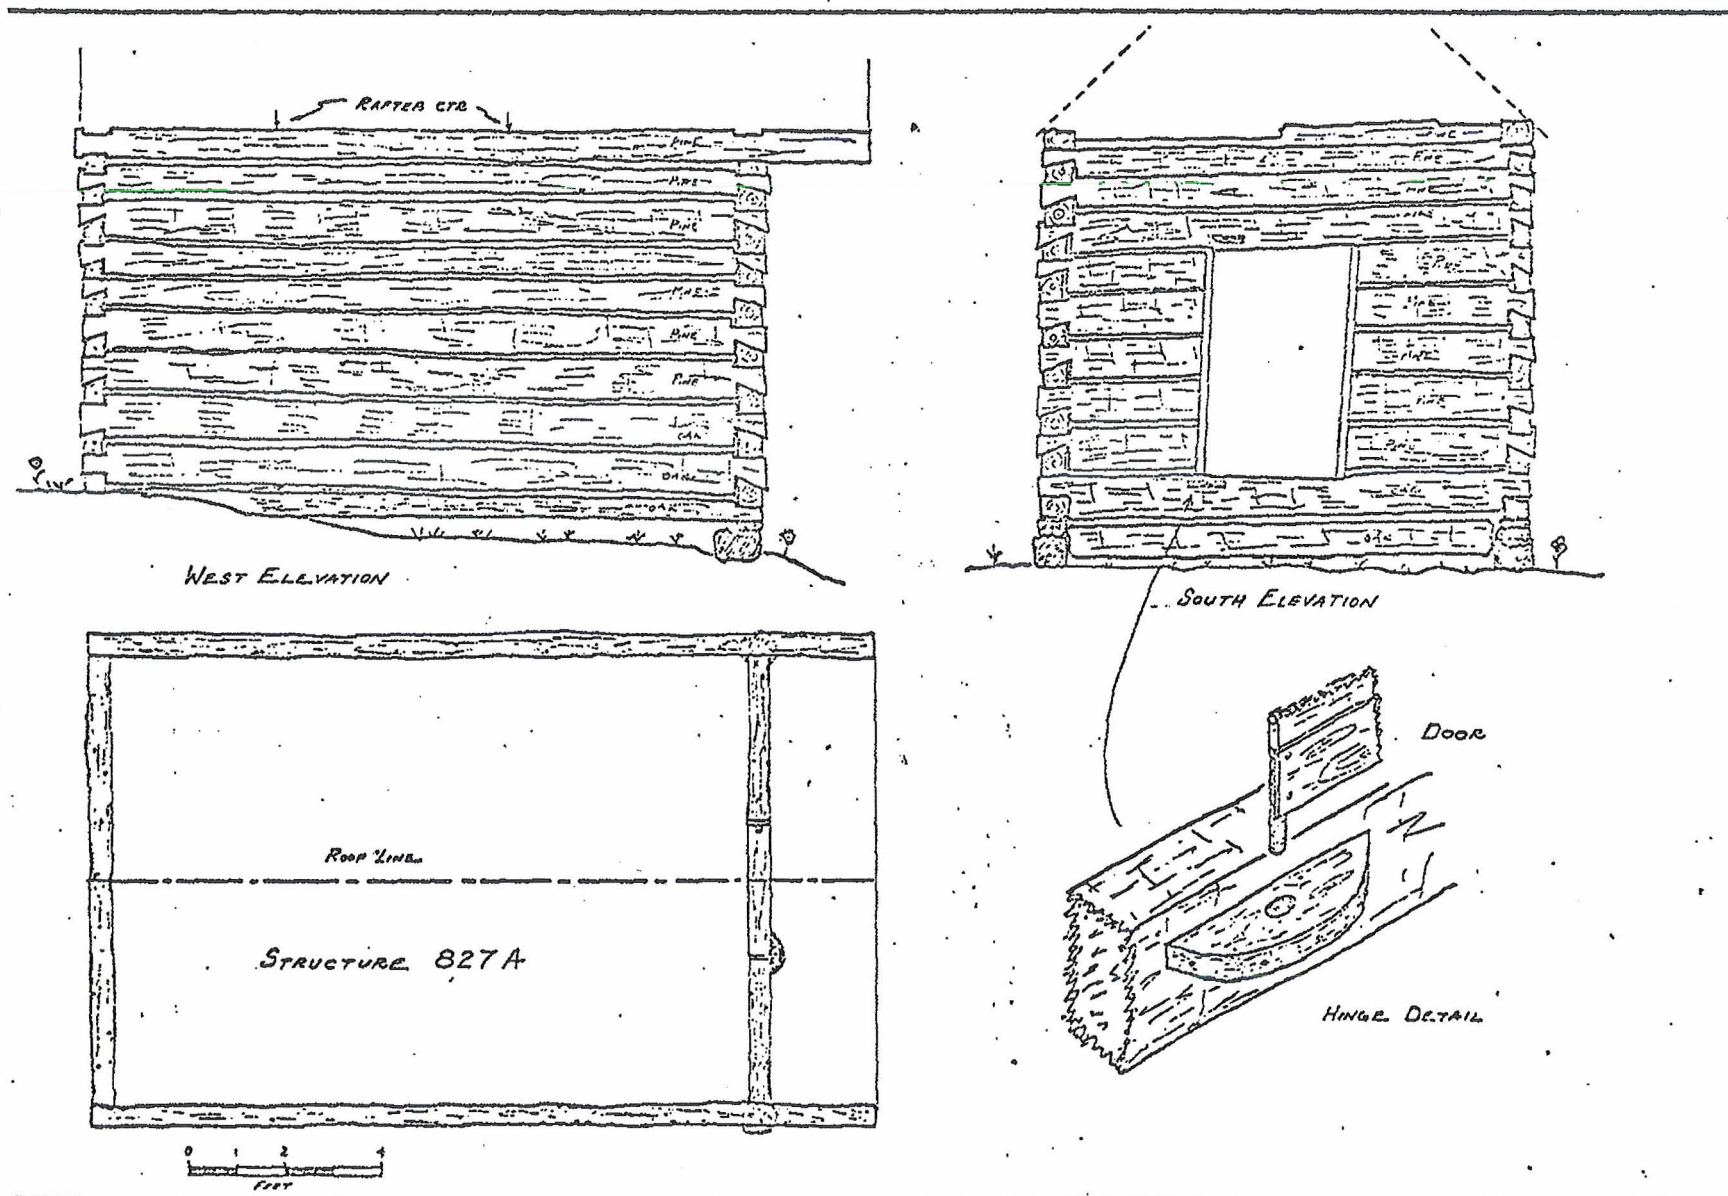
Plan, South and West Elevations, and Detail, Structure 827A.
